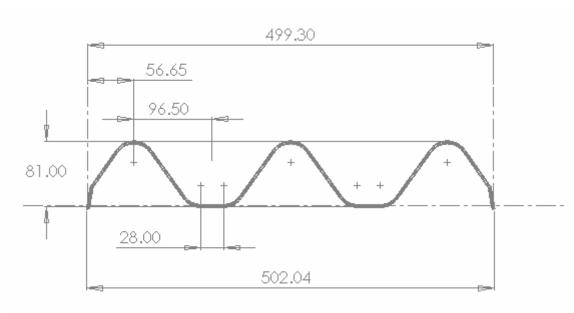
Thrie Beam Rail Cross-section (dimensions in millimeters)
